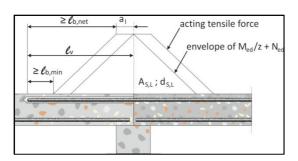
Anchoring of reinforcement to cover the line of acting tensile force
